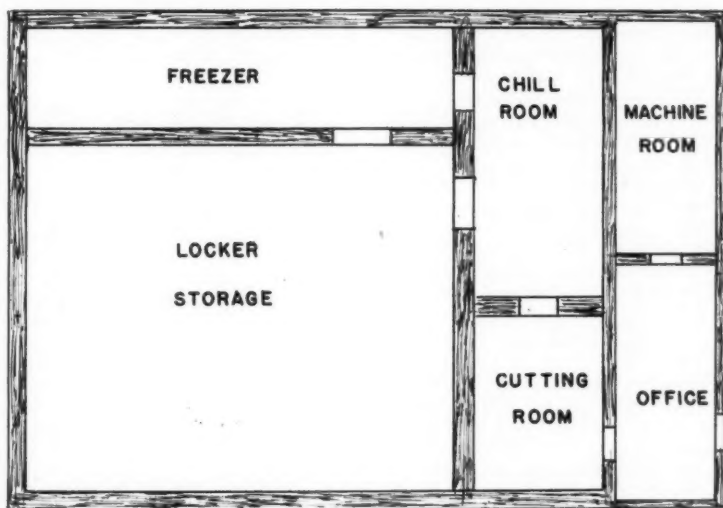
Floor plan of a popular arrangement in small locker plants.
